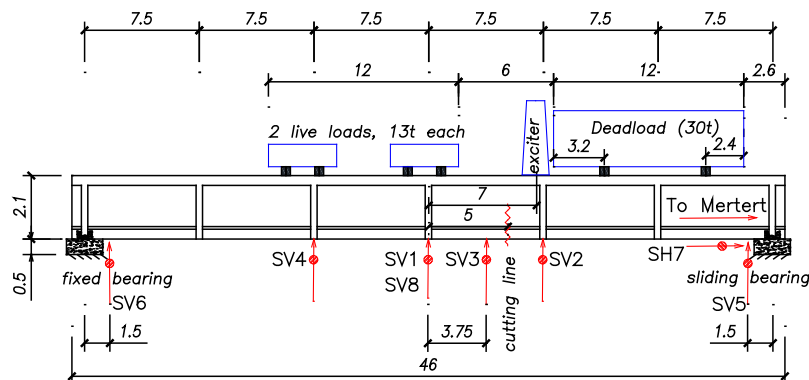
Configuration of the beam and positions of sensors for static measurements
